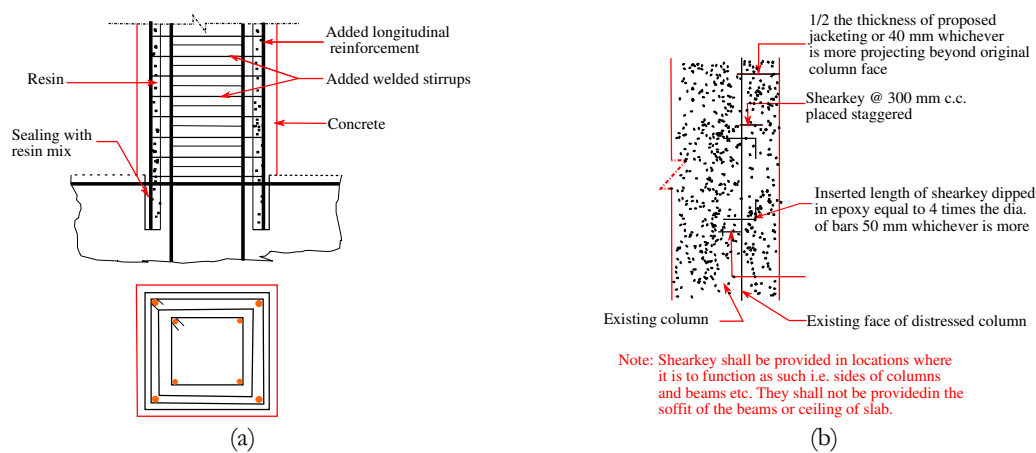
Schematic layout of column jacketing; (a) Column strengthening concrete jacket and (b) Details of shear key bars (adopted from CPWD [134])
